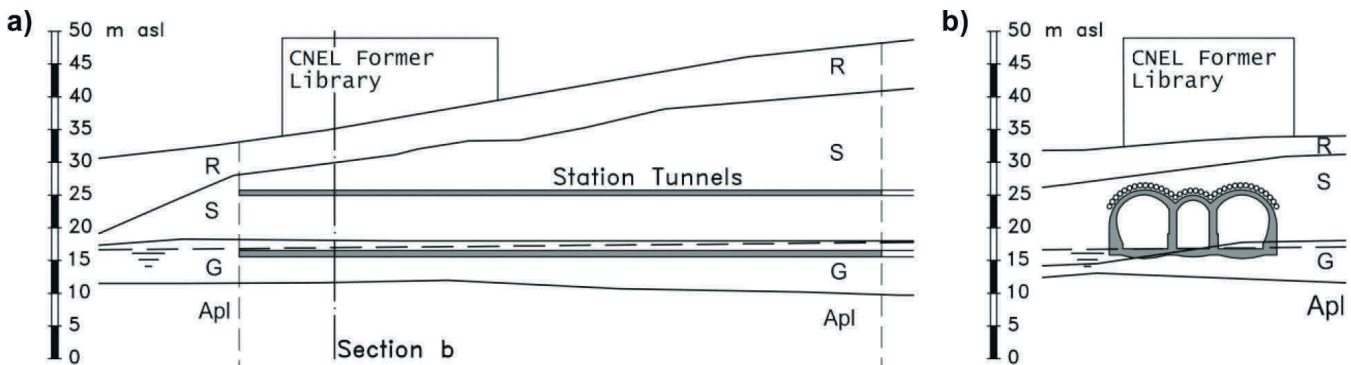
Geotechnical sections: a) longitudinal along the left tunnel; b) transversal at 15 m from the entrance.
